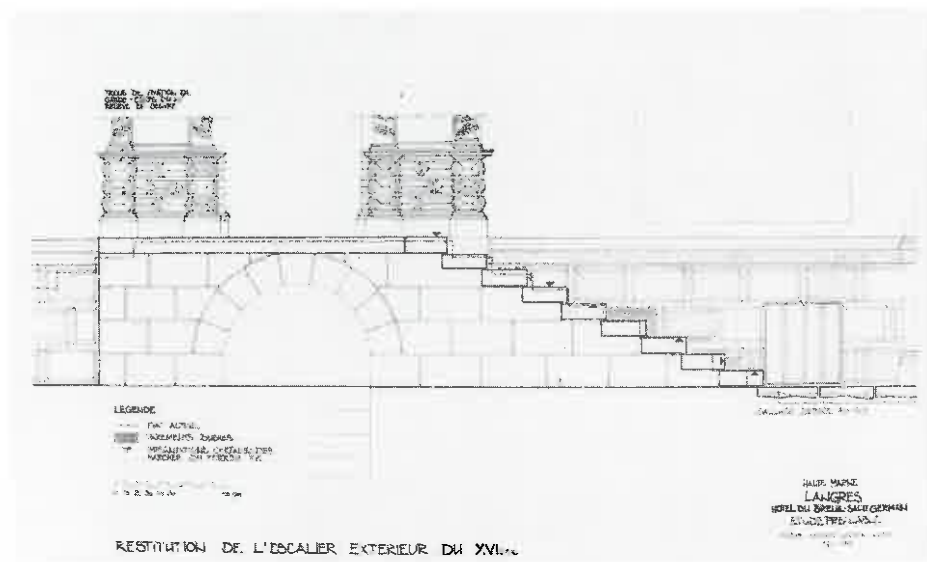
Breuil Mansion—Graphic reconstruction of sixteenth century residential wing stair [1].
